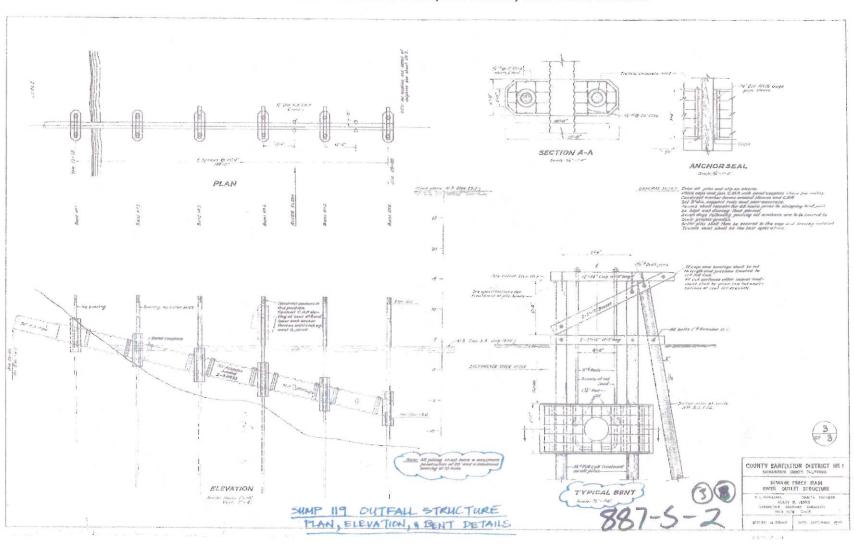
Outfall Structure Plan, Elevation, and Bent Details
